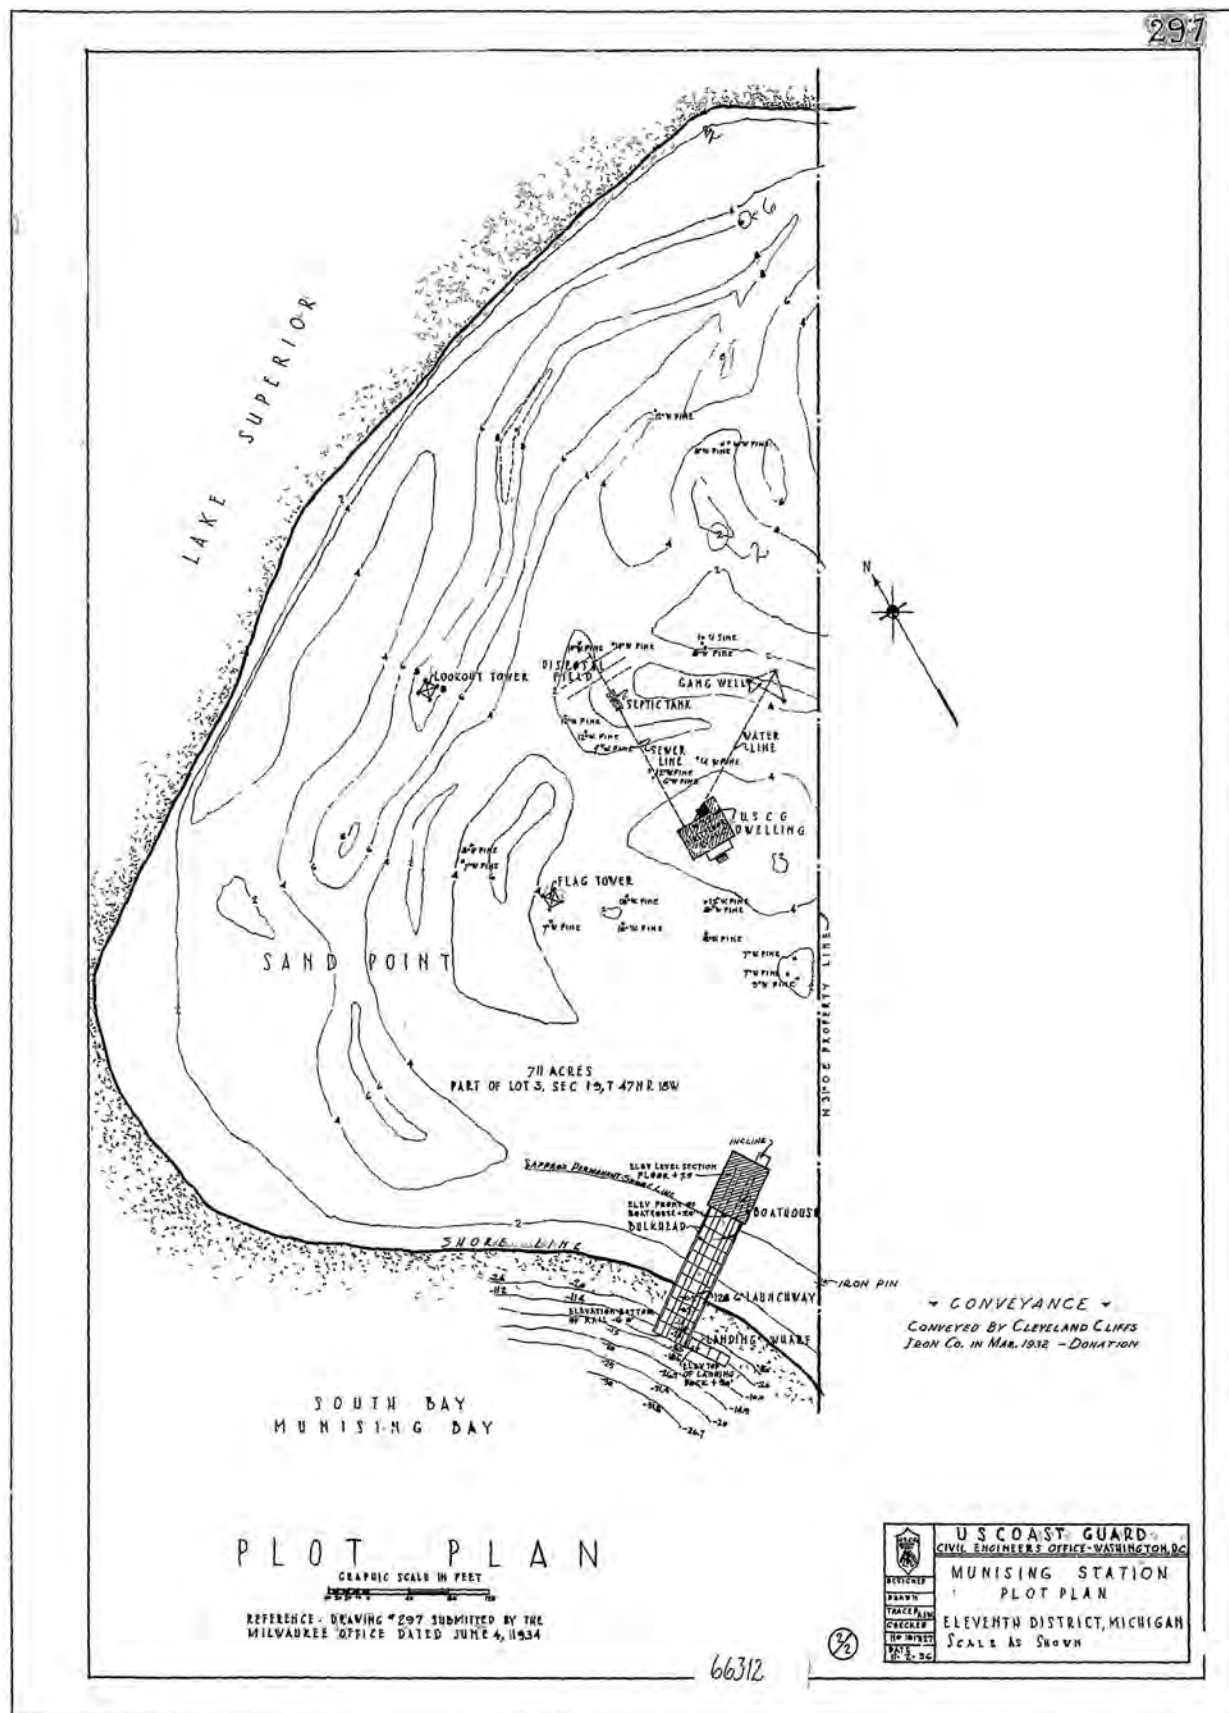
Munising Station Plot Plan, 1934. (source: PIRO Archives)
